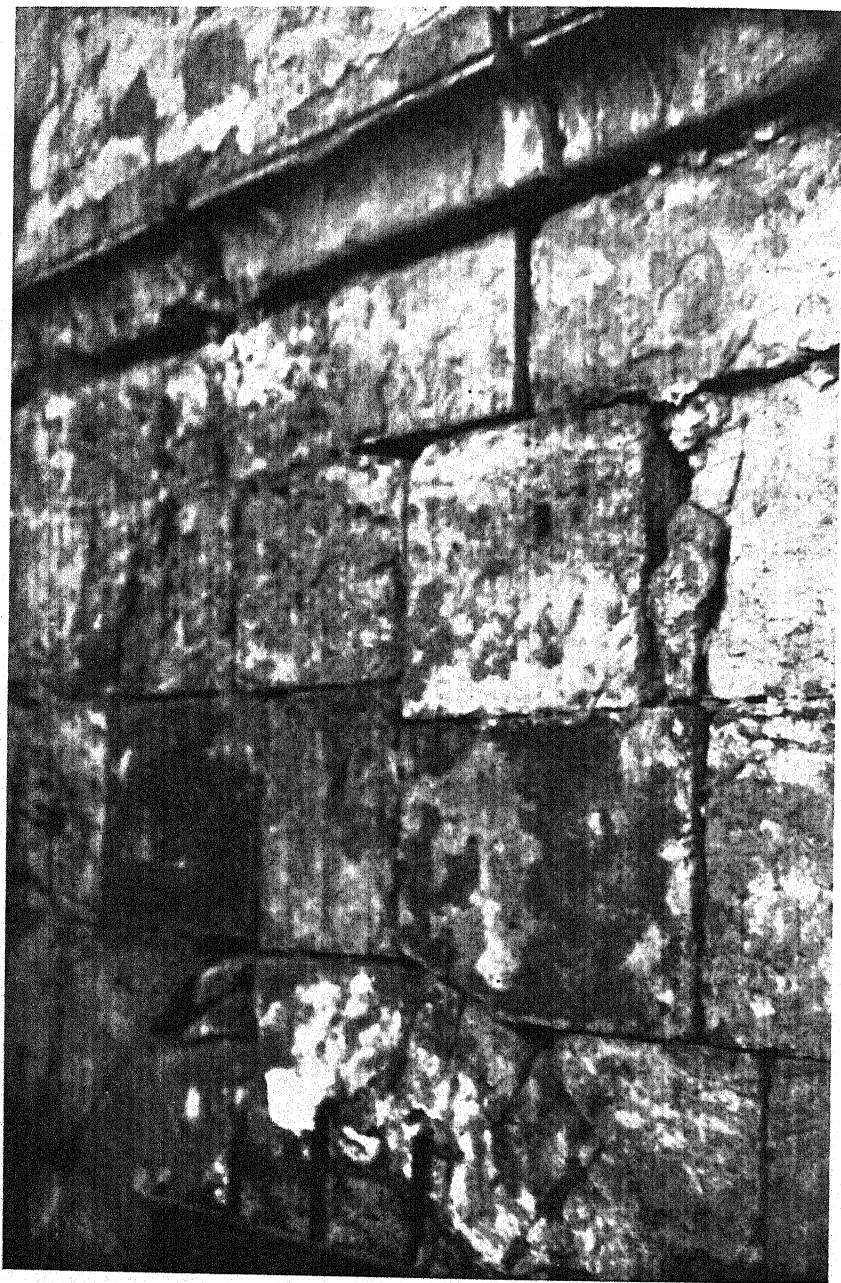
NORTH TRANSEPT HIGH VAULT. E. WALL
